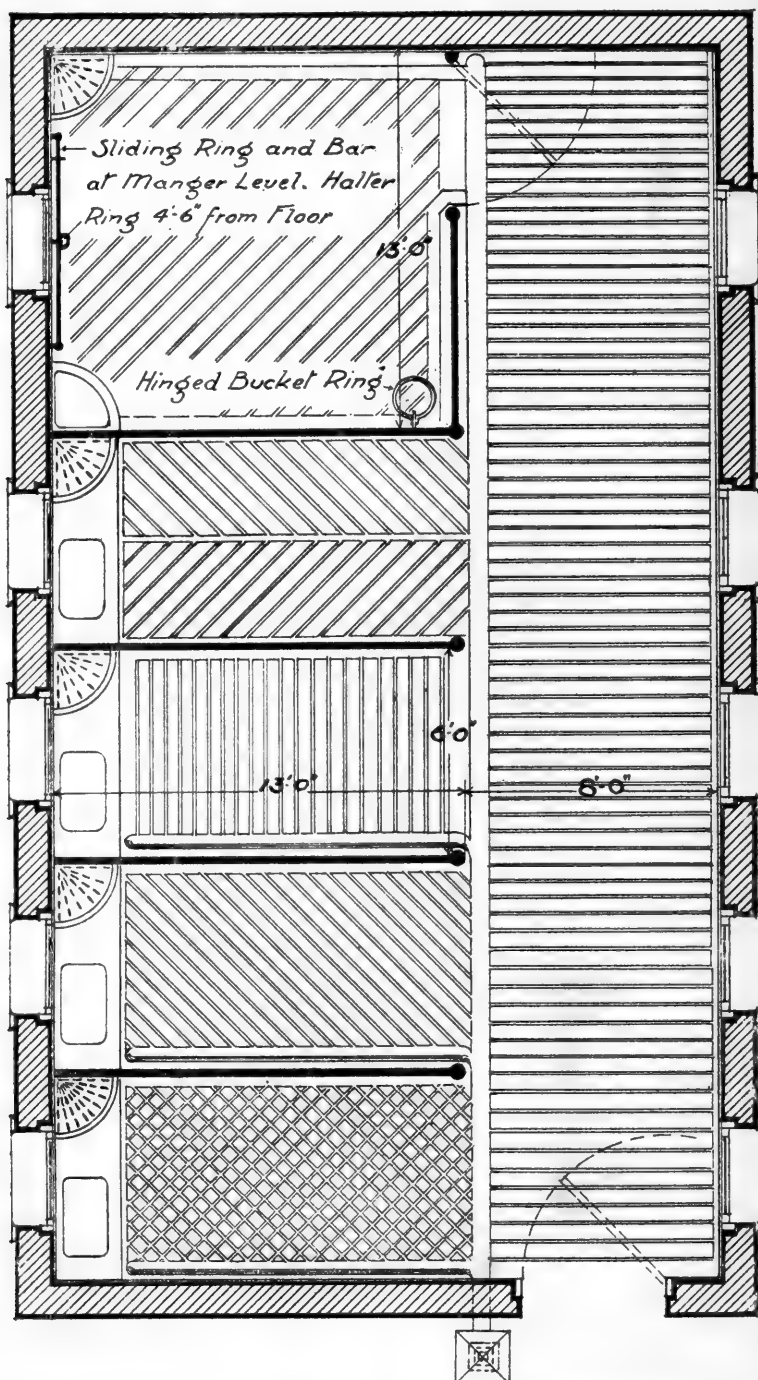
Plan of a single stable for heavy draught horses showing various forms of cement floor grooving of which the herring-bone type is best. The bucket ring should be fixed to the wall. The stable door may be made to open outwards or as shown.
